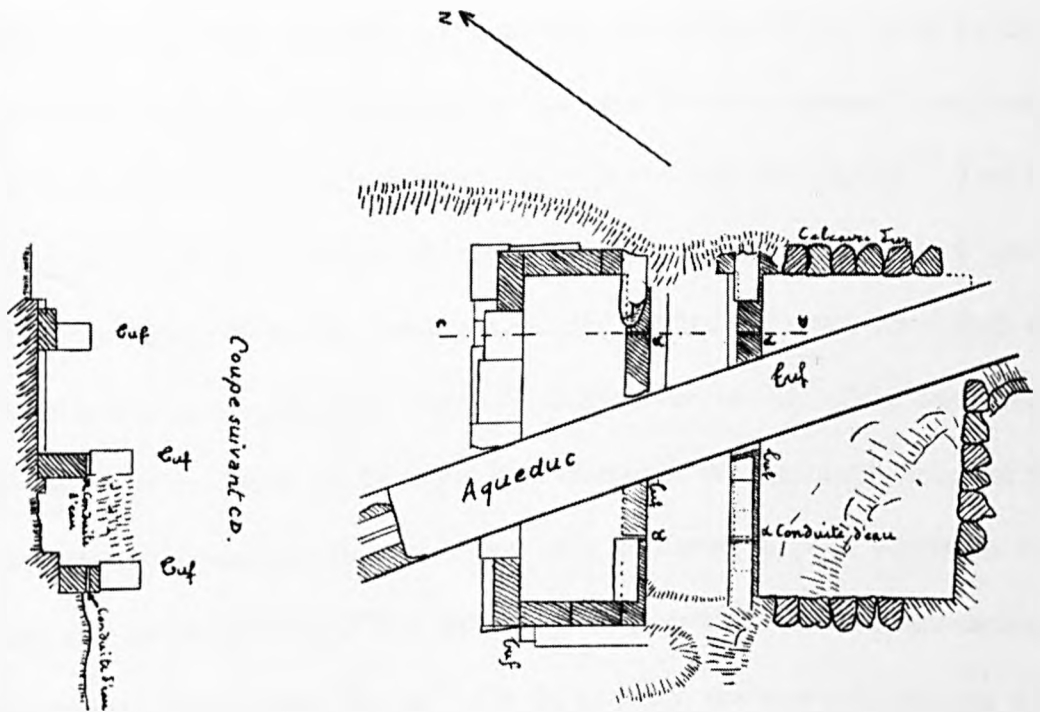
Ptoion: The archaic fountain: plan and cross-section (in Ducat [1971], fig. 48, p. 428).
